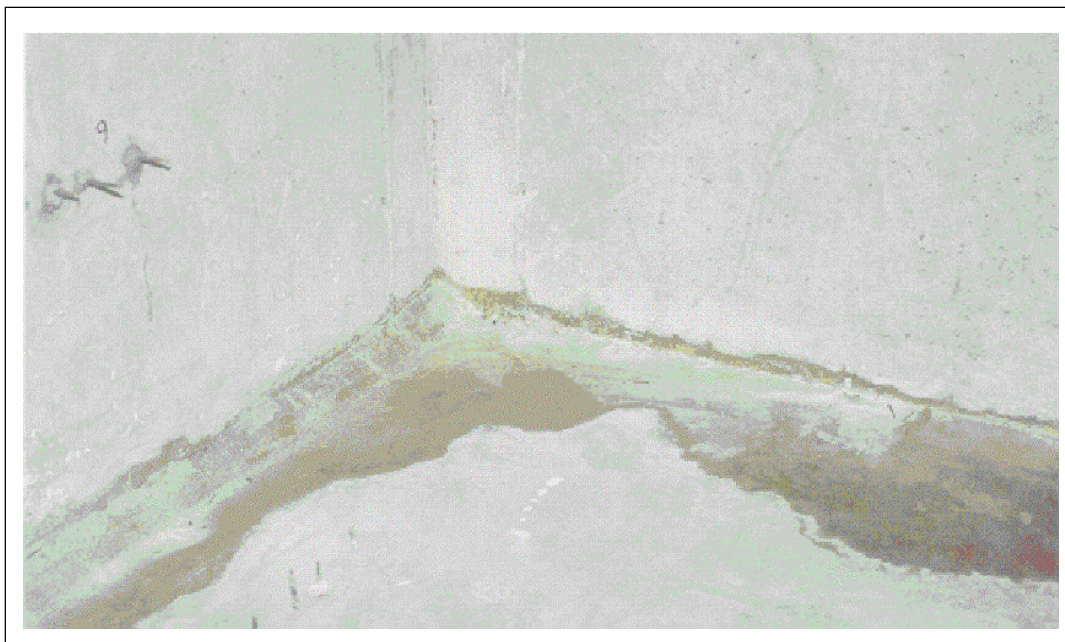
Active intrusion in the concrete basement in the southeast corner of the concrete basement.
